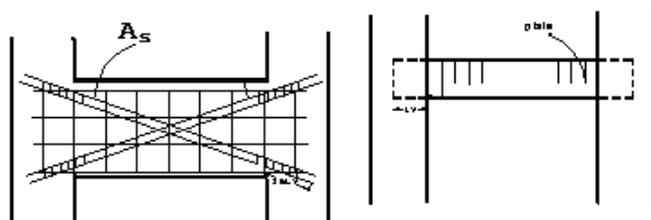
Concrete link beam with diagonal rebar and steel link beam with plate
